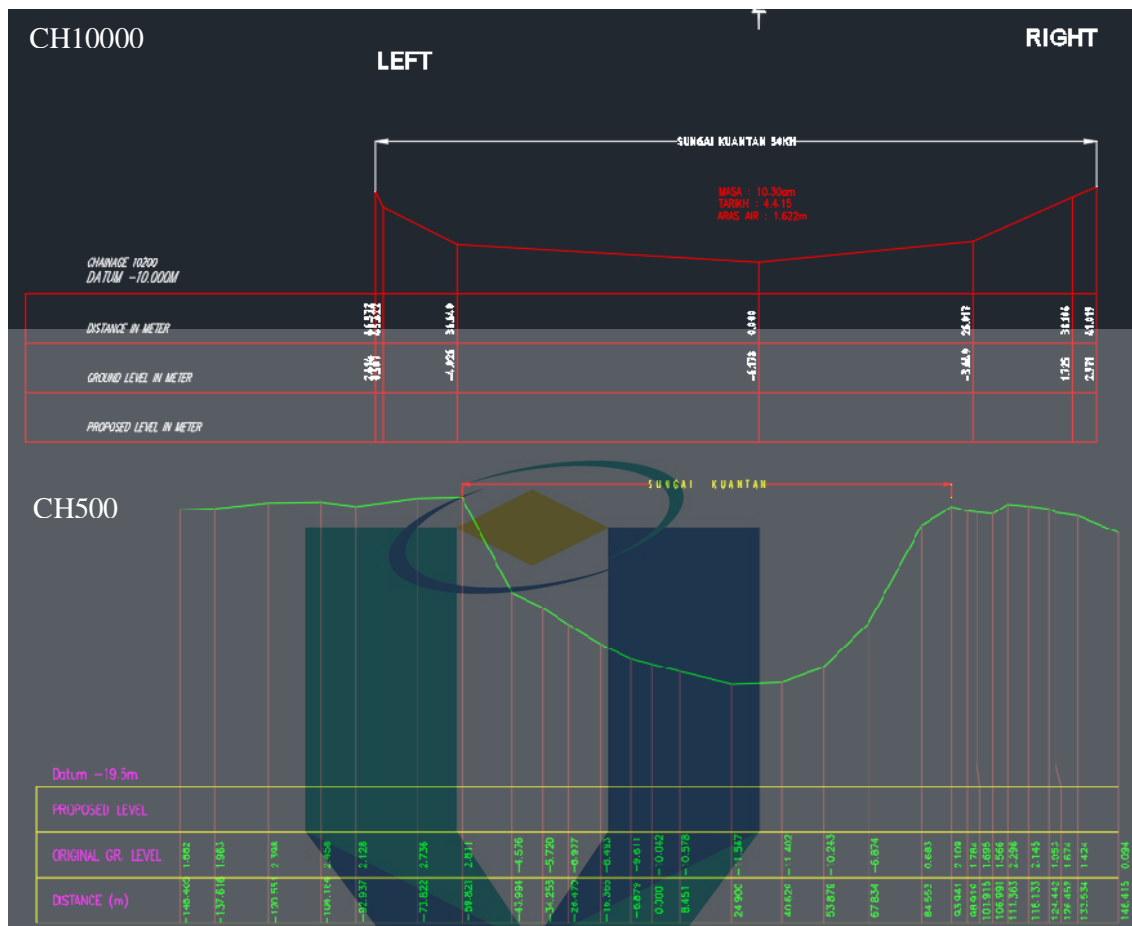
The cross-sectional view at chainage CH10000 and CH 500
